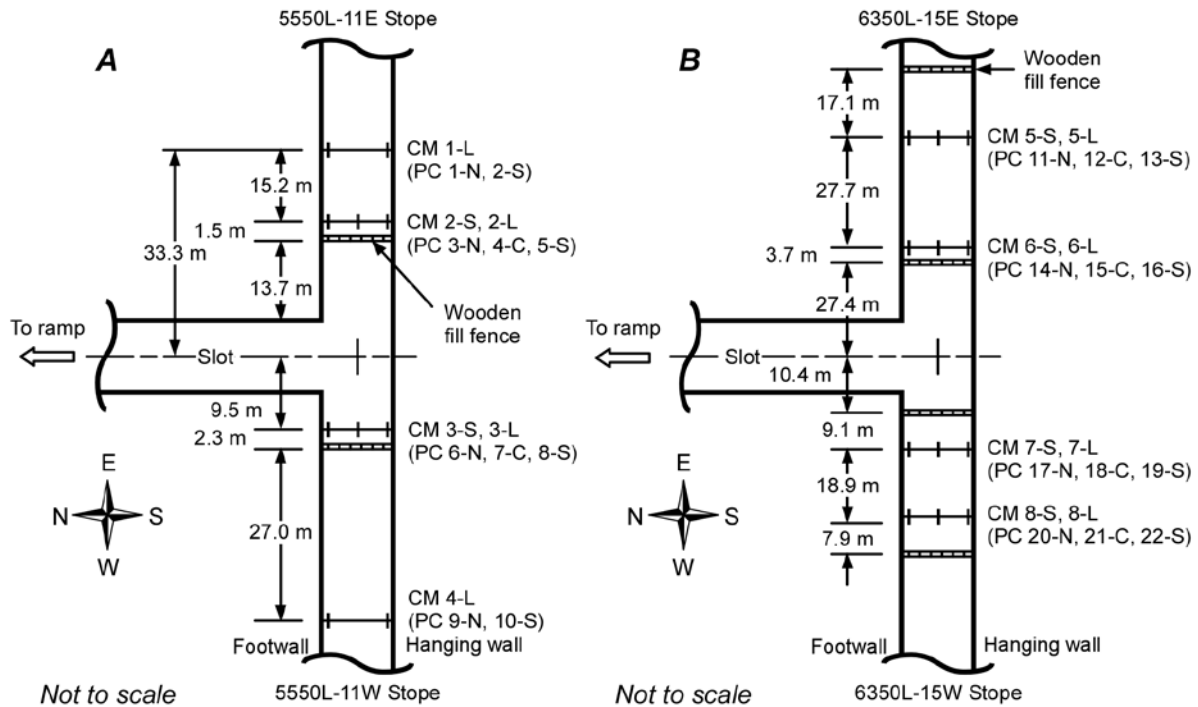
Plan view of backfill instrument locations: (a) 11 stope on 5550 level and (b) 15 stope on 6350 level
